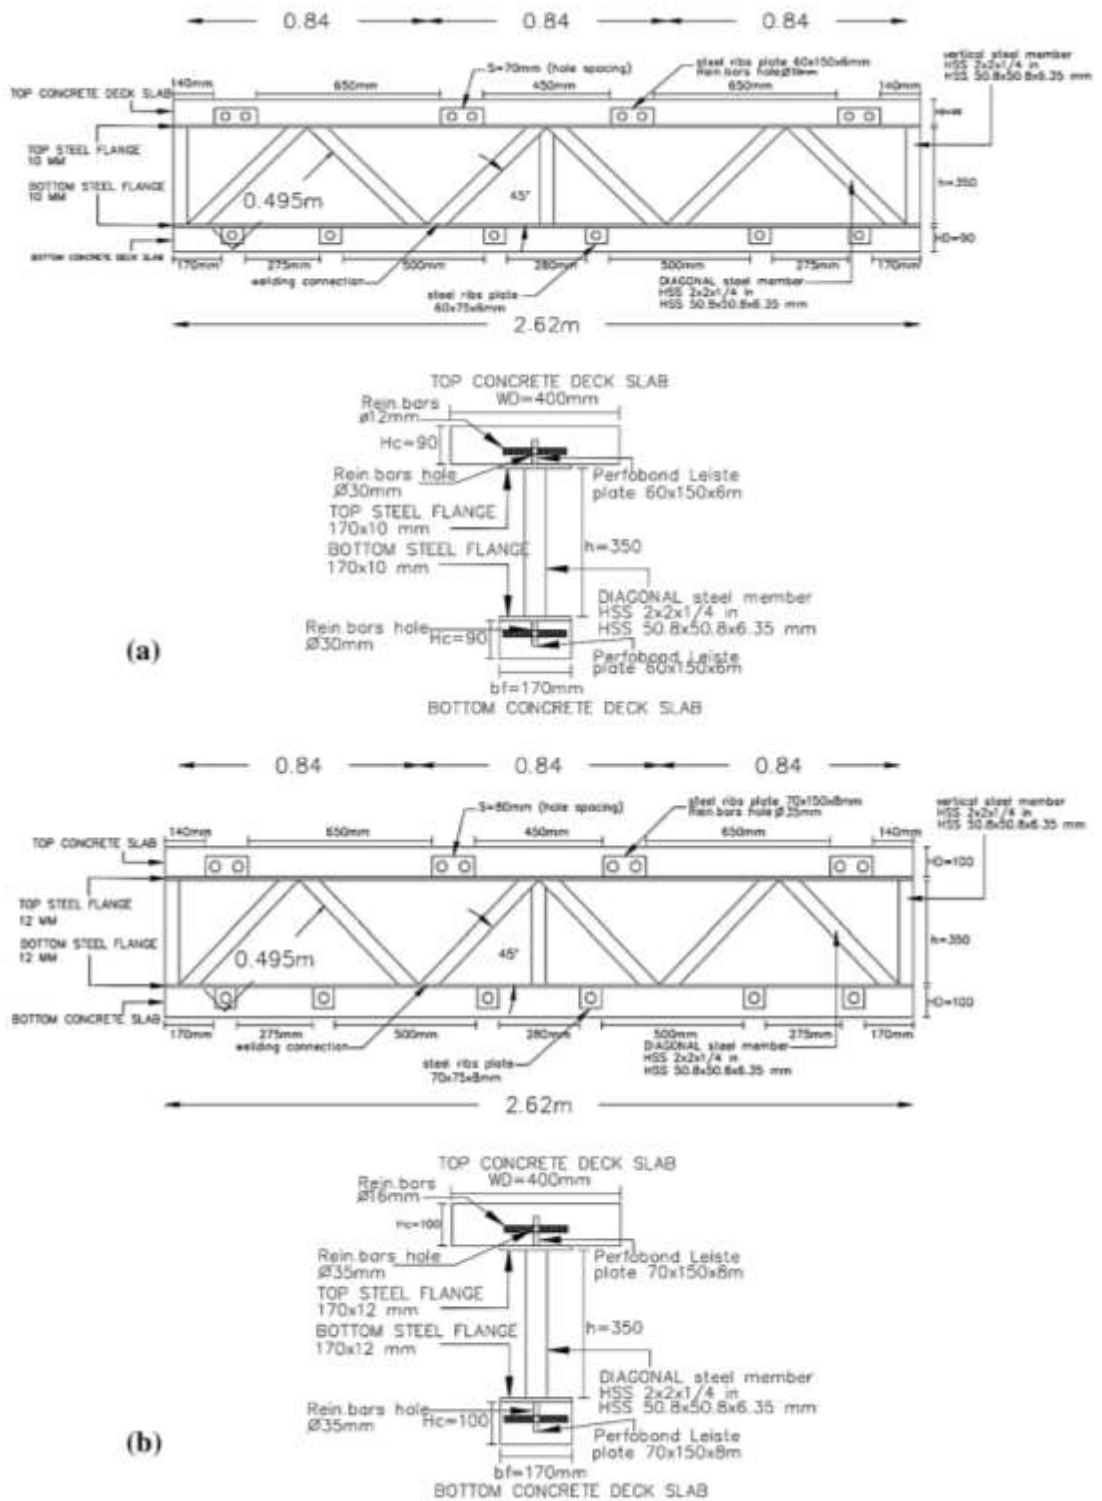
Second Category Composite Truss Girder (DCTG) models. (a) Layout of Specimen one (DCTG-1), (b) Layout of Specimen Two (DCTG-2)
